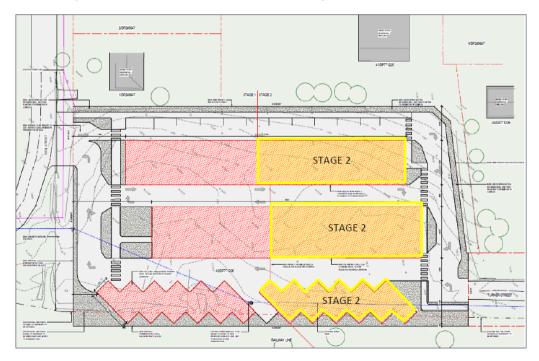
Proposed Staging of the Development at Lot 42, DP 771226, 1 Turner Street, Denman (note revised plans have since been provided which removes connection to Turner Street)
